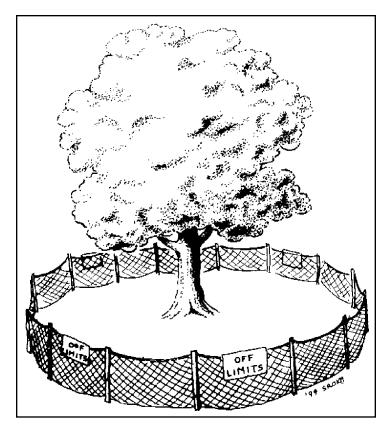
A highly visible fence and "off limits" signs should be placed around the protected root zone of each conserved tree to prevent any site disturbance and mechanical injury.
